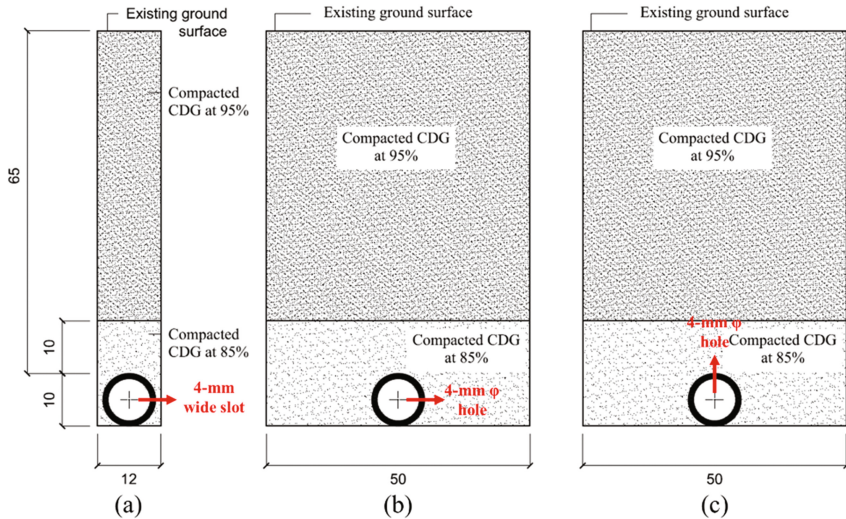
Details of the “mainlaying scheme” regions for the model packages: (a) Test 1; (b) Test 2; (c) Test 3.
